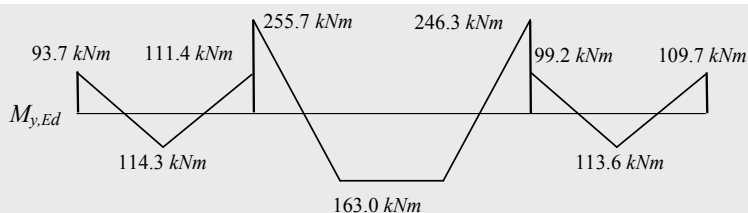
Internal forces on beam E1-E4 in the 4<sup>th</sup> floor for load combination 1
